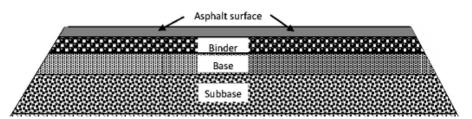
Flexible pavement profile (adapted from (Garbarino et al. 2016))
